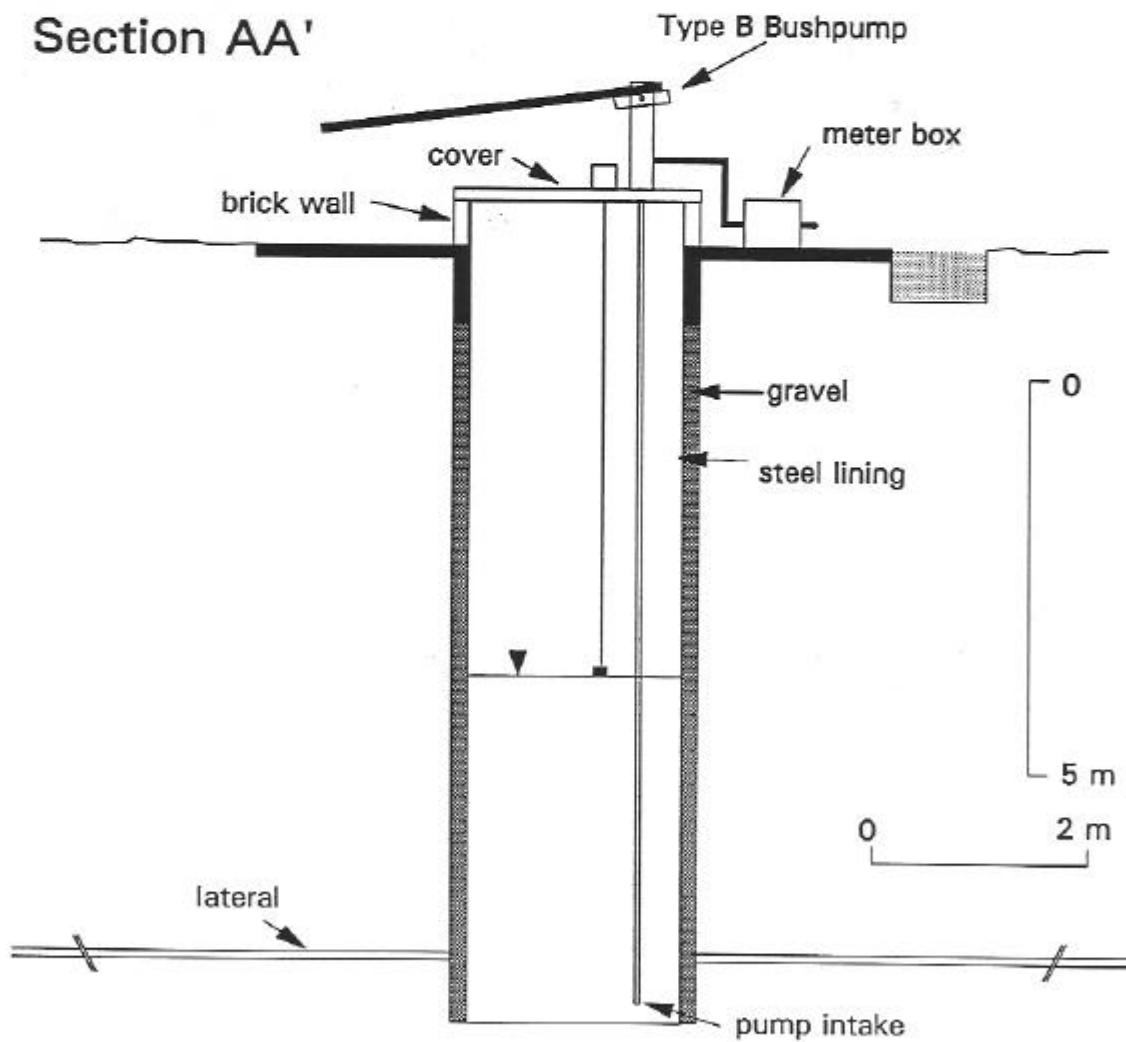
Collector well and headworks construction, site 6, Matedze
